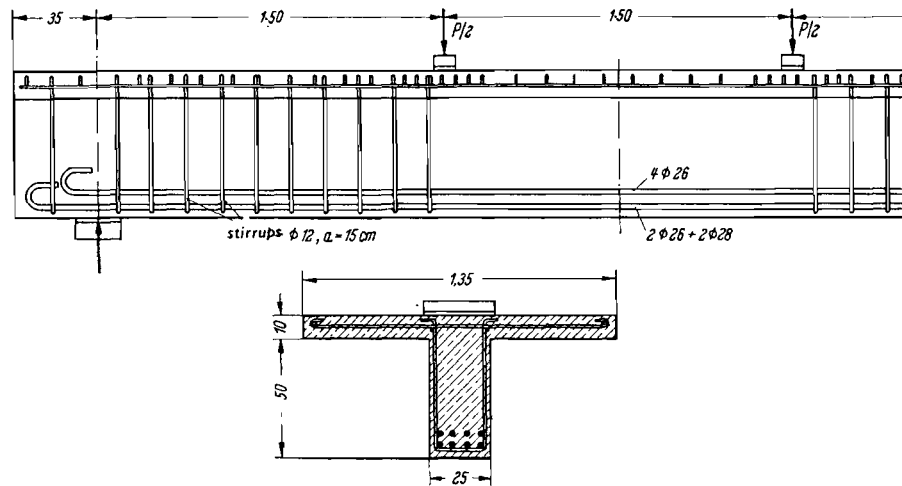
Test beam 1132 of the supplementary tests for Communication No. 48 of the German Committee on Reinforced Concrete (half safeguard against shear failure).
